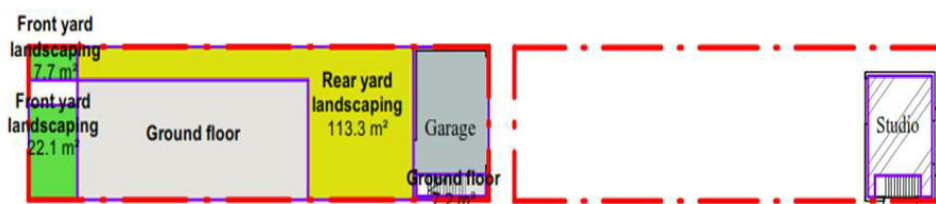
The proposed layout provides clearly defined private open space areas for both the existing principal dwelling and the proposed granny flat, in accordance with the Bayside DCP 2022 requirements.
